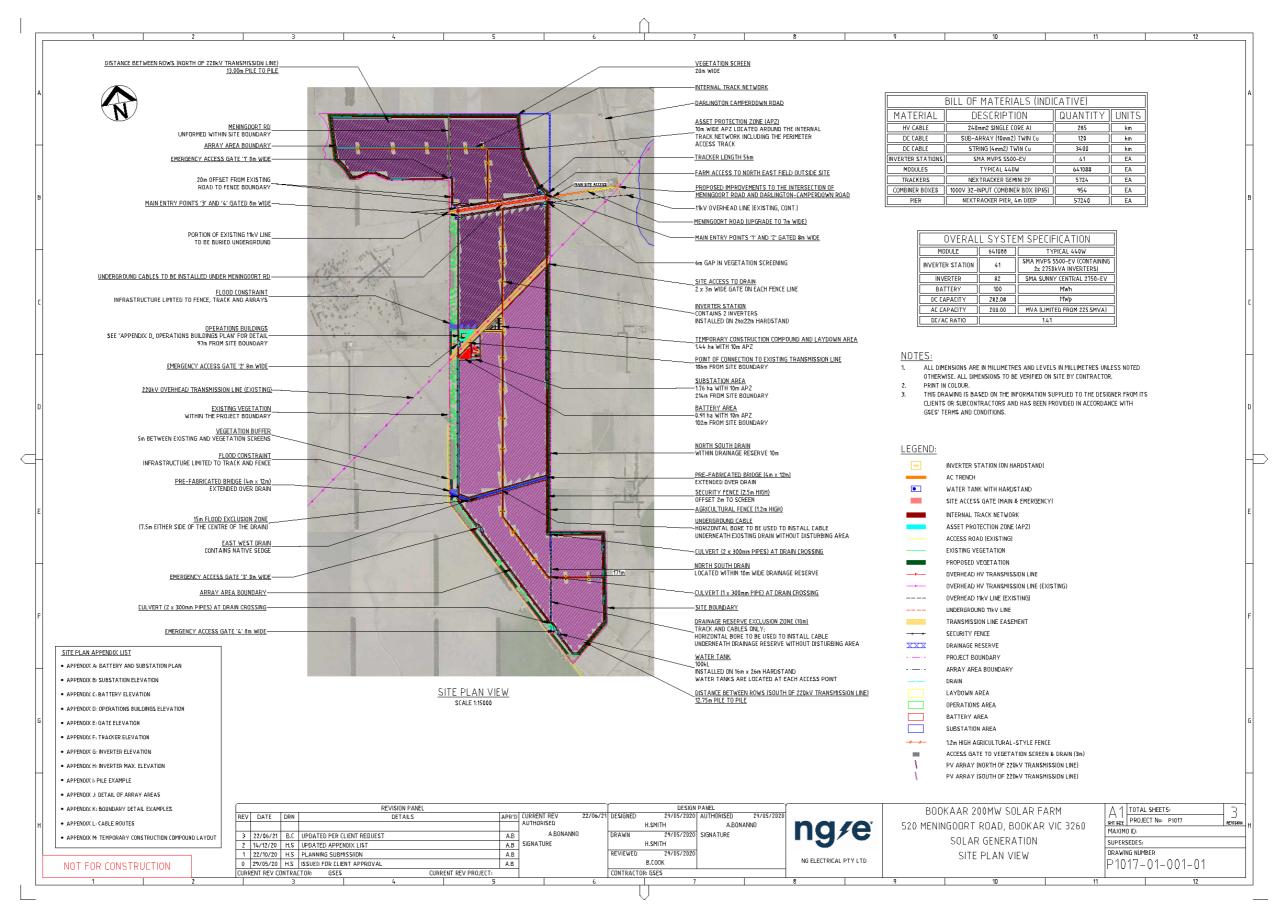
Proposed Bookaar Solar Farm – Site plan (See the 'Site Plan' that accompanies the planning application for a scaled version)
